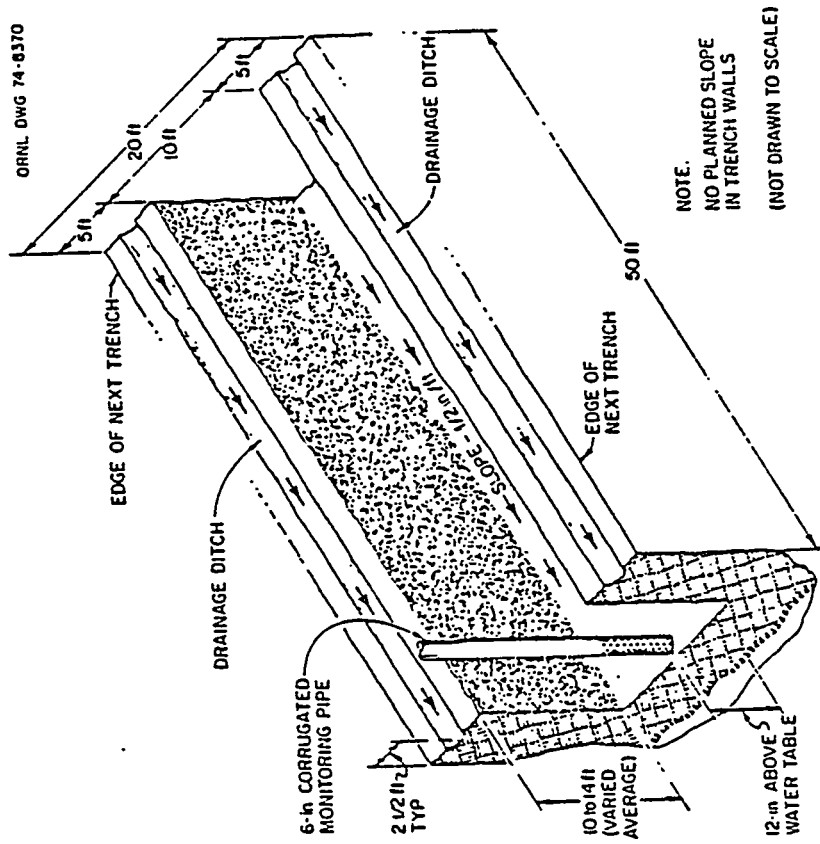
TYPICAL SWSA DISPOSAL TRENCH LAYOUT Binford and Gissel, 1975.
